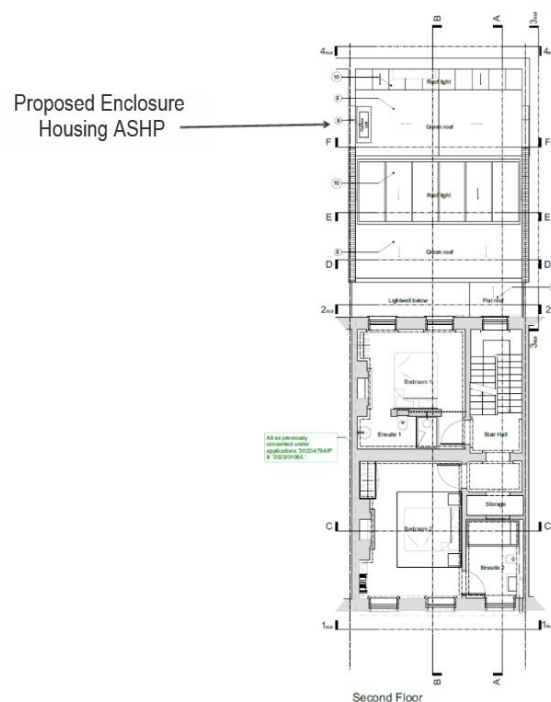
Proposed 2<sup>nd</sup> Floor Plan Excerpt – Studio Stassano drawing no. 2820) A02
